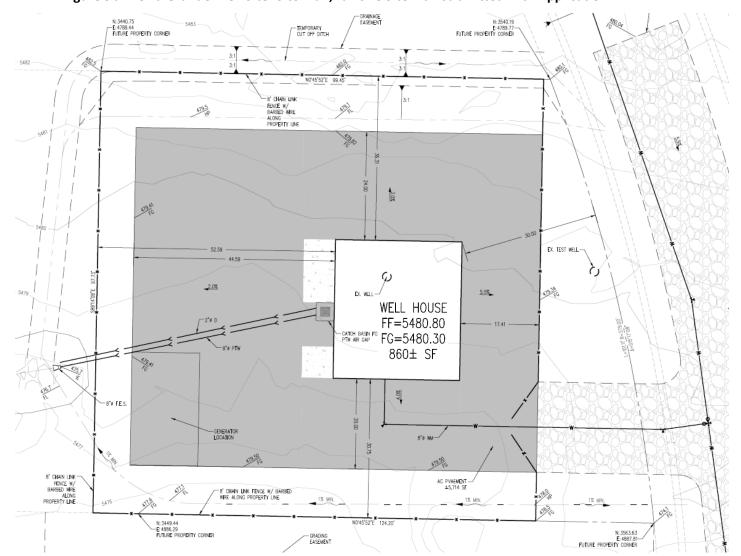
Tierra Grande Well Site- Site Plan; full size Site Plan submitted with Application
